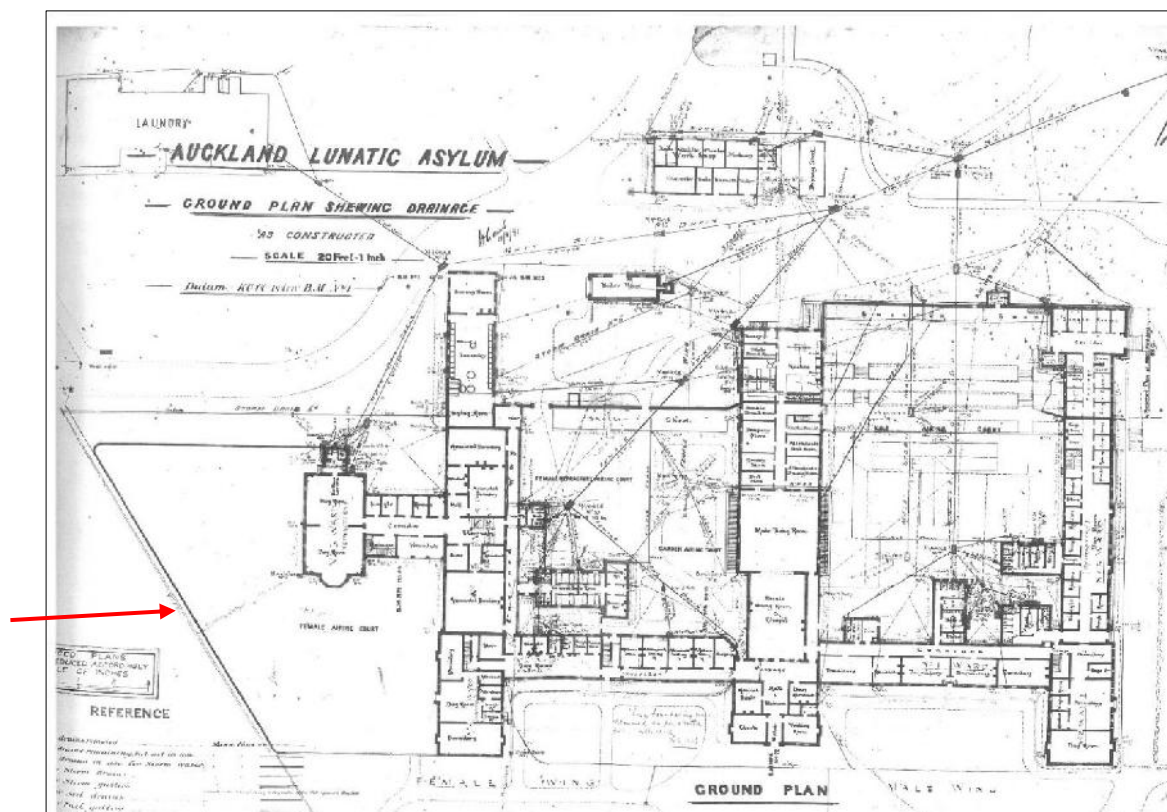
1891 site plan showing walled female airing court indicated with arrow.
